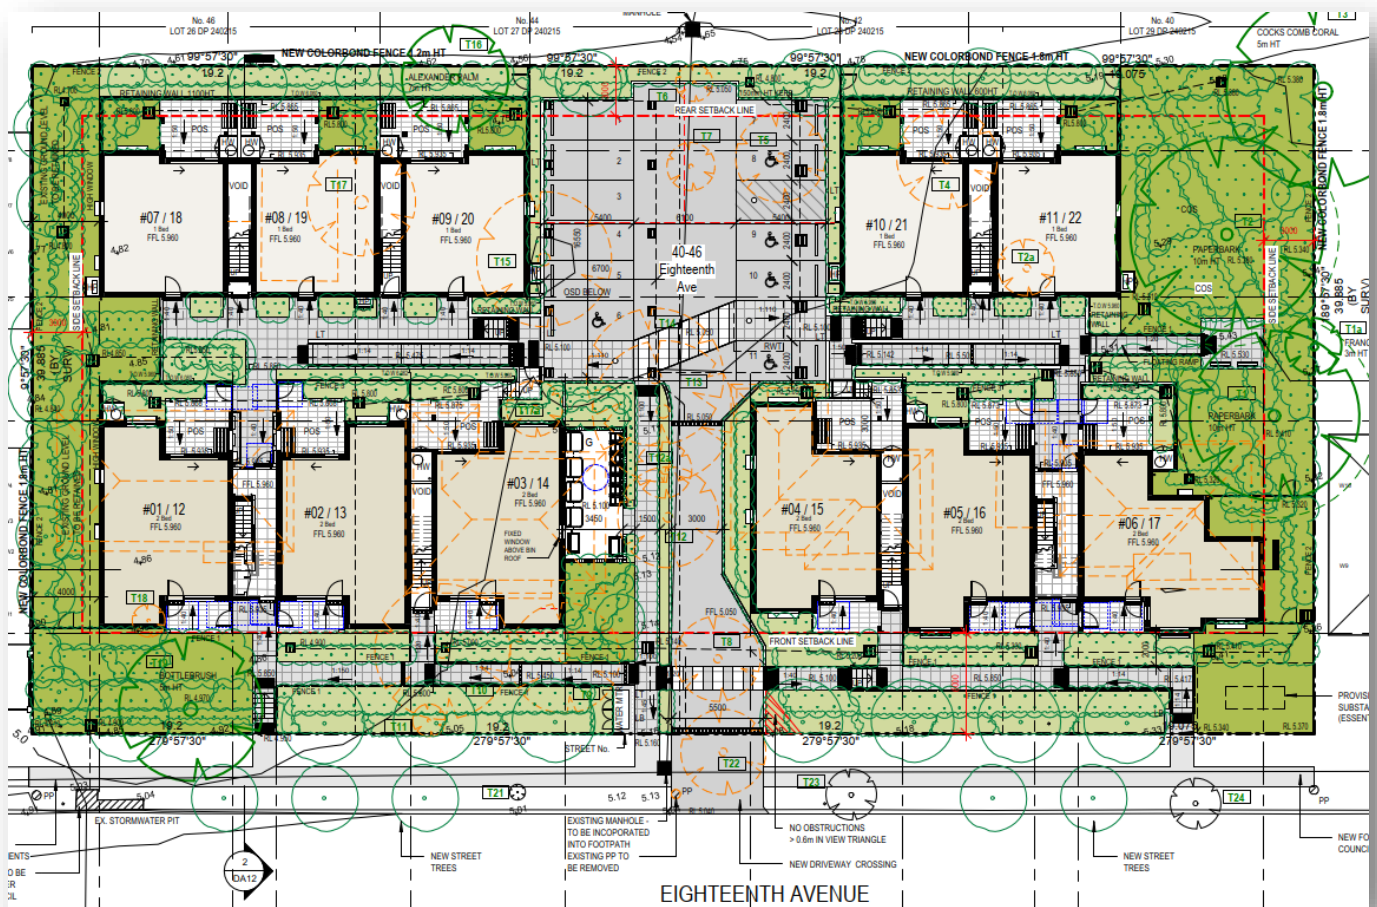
Extract from Architectural Plans – Site Plan (Source: Architectural Plans, Brewster Murray, dated 23/07/2024)
